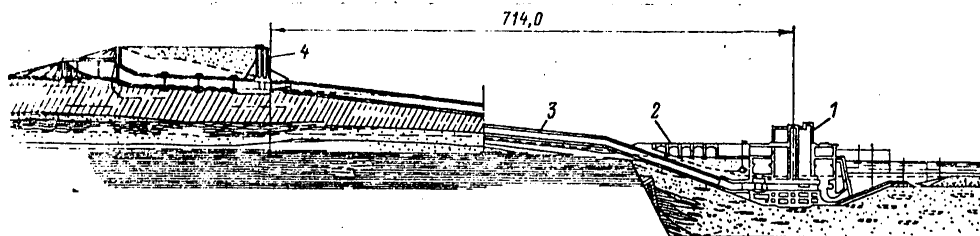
Lengthwise Cross Section Through Structures: 1--GAES structure; 2--ferroconcrete trestle; 3--conduits; 4--water intake
